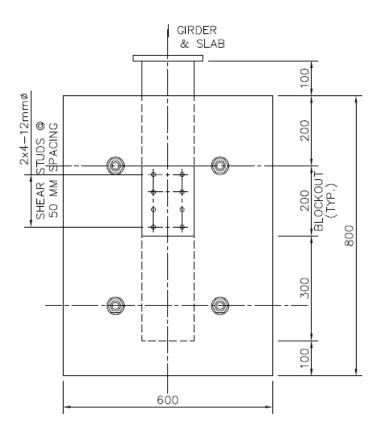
Elevation of specimens PO-2A and PO-4B showing arrangement of clustered studs
